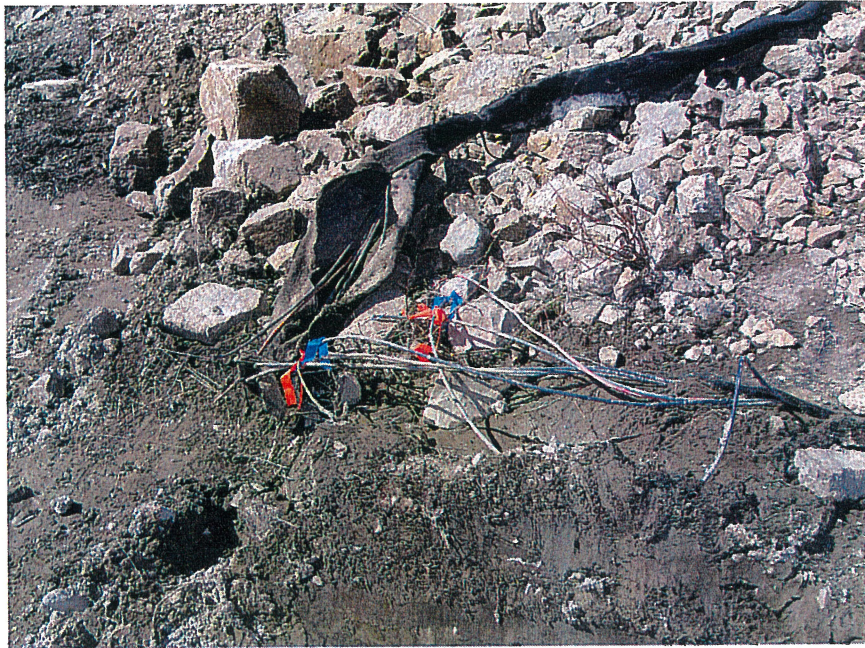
Damaged Piezometer cables at the Main Embankment.
